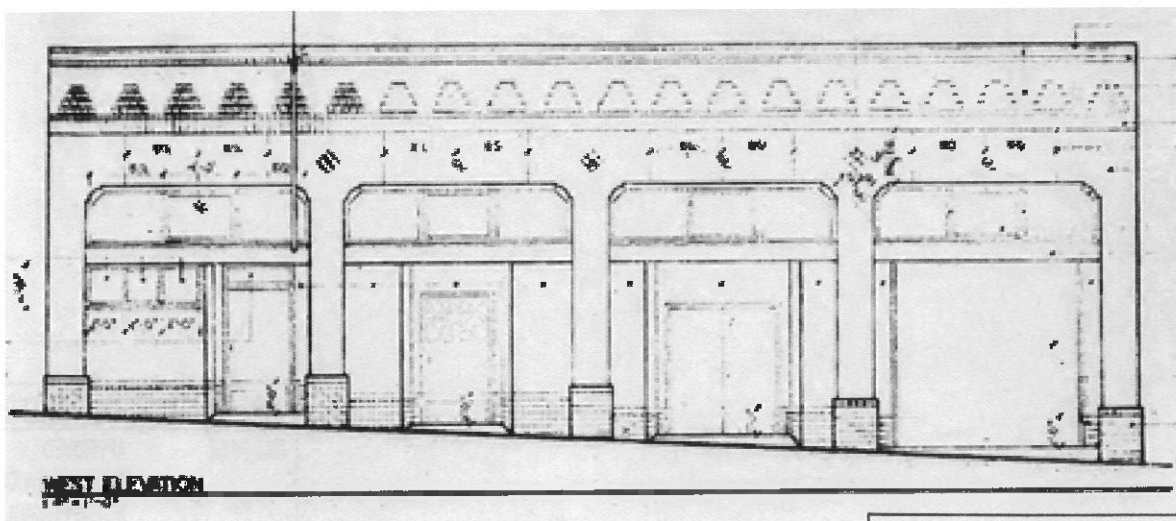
1985 Renovation of 206 5th Avenue S - West Elevation
